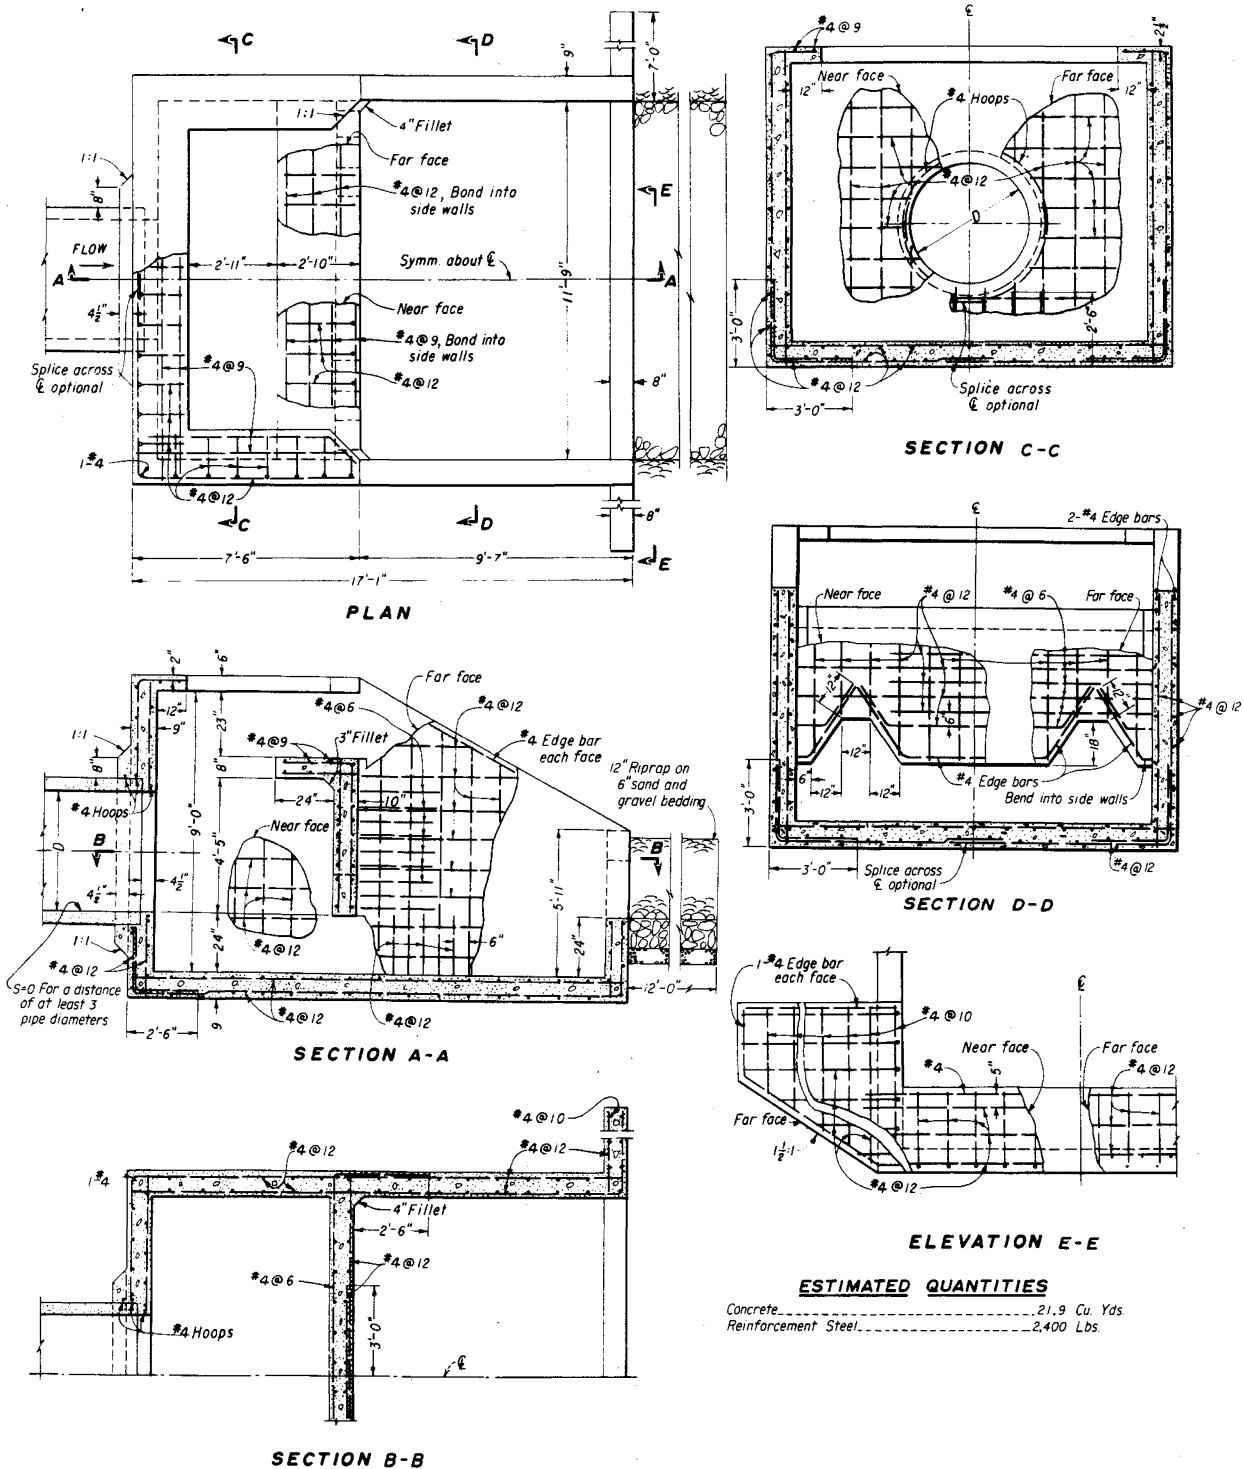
Type 8 baffled outlet. 103-D-1347
